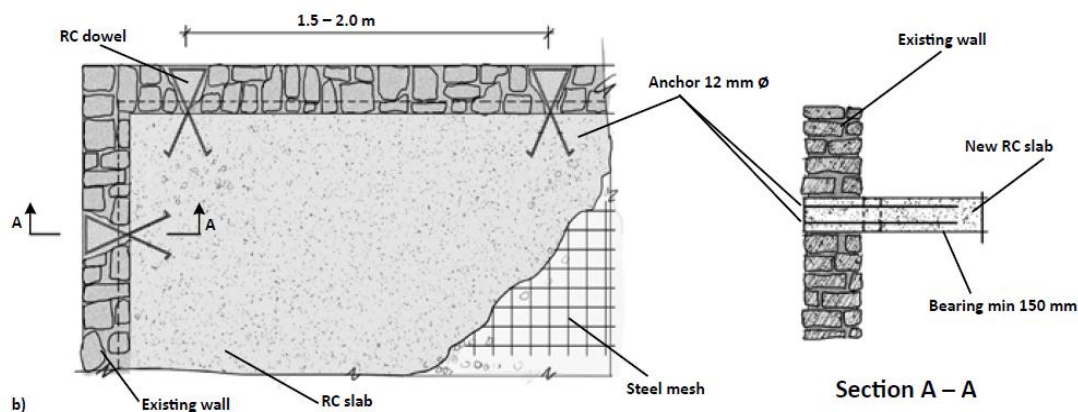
Retrofitting the floor and roof structures with a new RC slab
